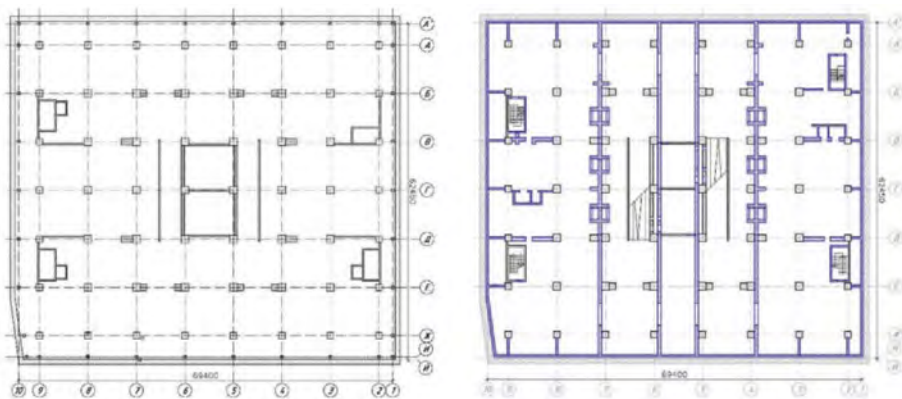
Scheme of the underground section before (left) and after (right) reinforcement with transverse diaphragms and shear walls along the section perimeter.
